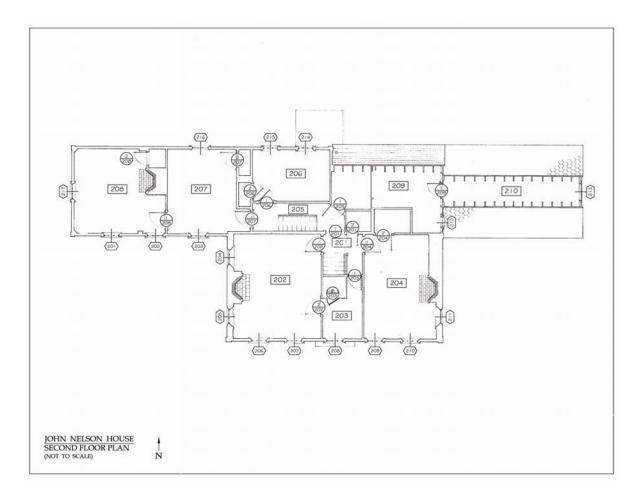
Second Floor key plan (adapted from HABS drawings).
